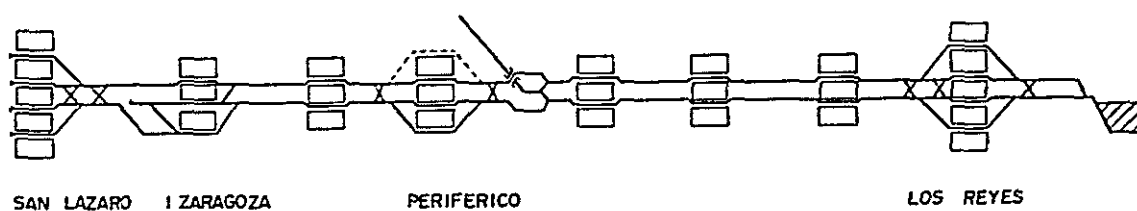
A Plan for Future No. 1 Route Arrangement
